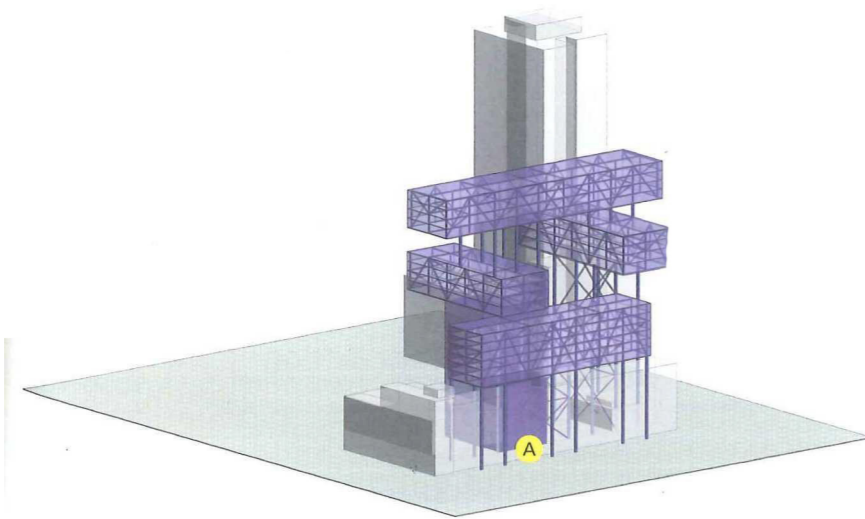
| A schematic overview shows how large blocks can be added to the Kruisplein (Weenapoint). This example adds no extra load to the construction of the existing building. Its new structure allows the blocks to 'fly'. (source: (Sansón & Schoorl, 2017), p. 93)
